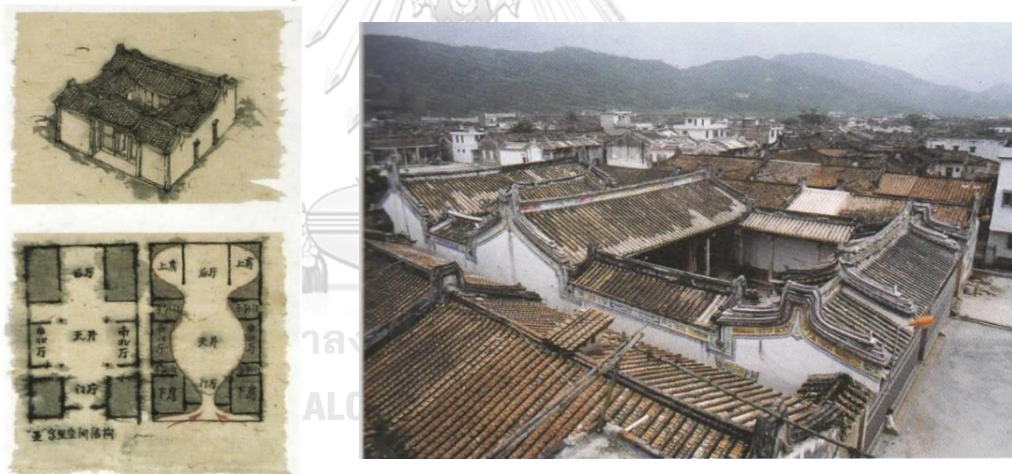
15 The building layout of Ancestral Hall in Chao Shan, with a Chinese building layout of “four golden points”, or “四点金”(林凯龙, 2013).
